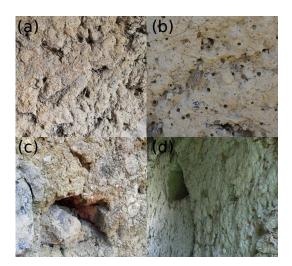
Close views of typical examples of earth wall surface composition. (a) Haut Marland; (b) Kervoilan; (c) Le Guézy; (d) L'Etoile du Matin.
